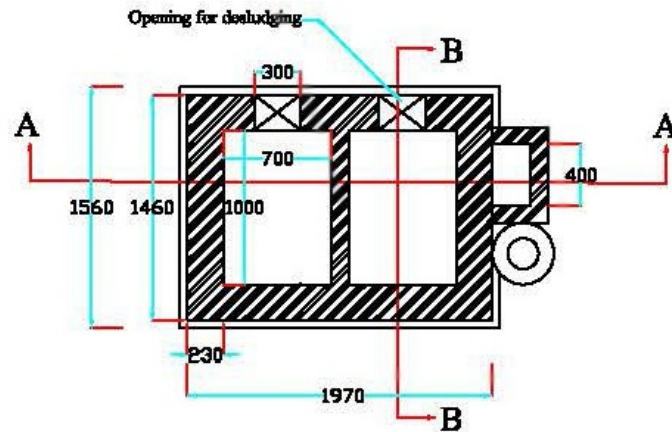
Plan of vault of UDDT, (Source: DWSS)
